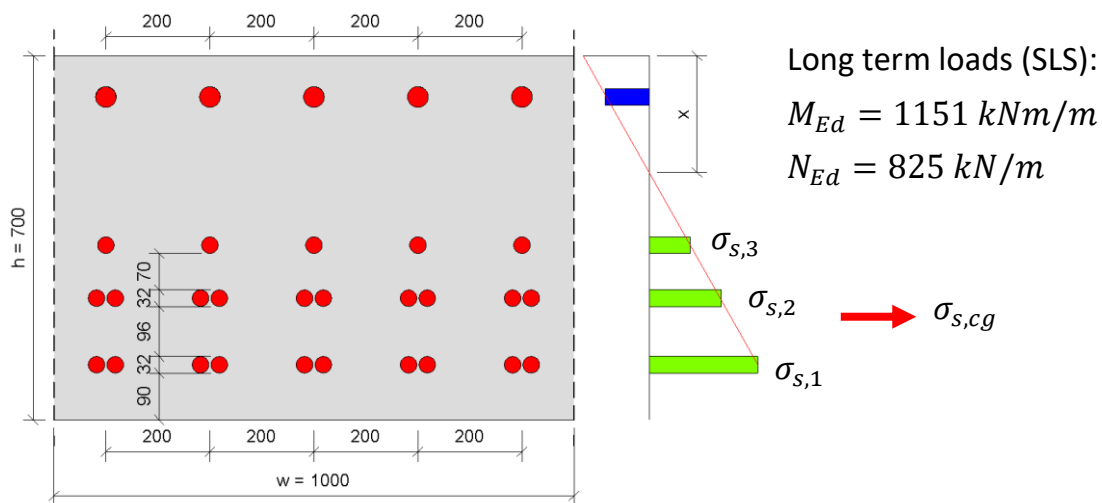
Reinforced cross-section of 1-meter width with three layers of tensile reinforcement (in scale drawing)
